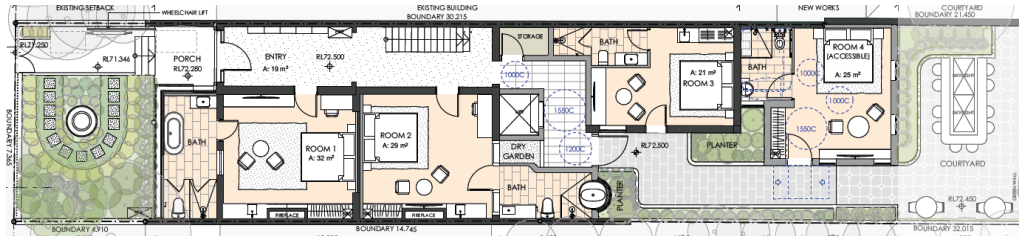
Proposed ground floor west demolition plan – 40 The Avenue, Randwick (Source: PTI Architecture)
